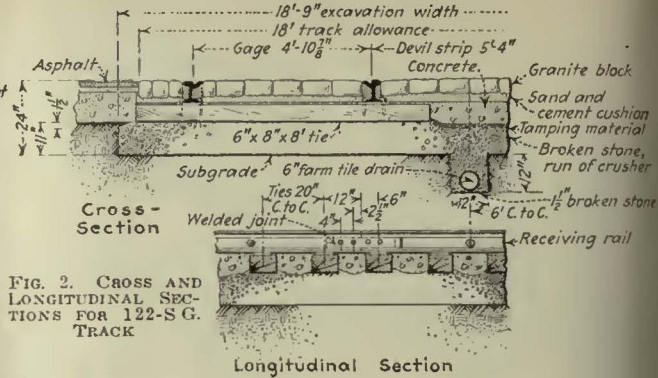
CROSS AND LONGITUDINAL SECTIONS FOR 122-S.G. TRACK
